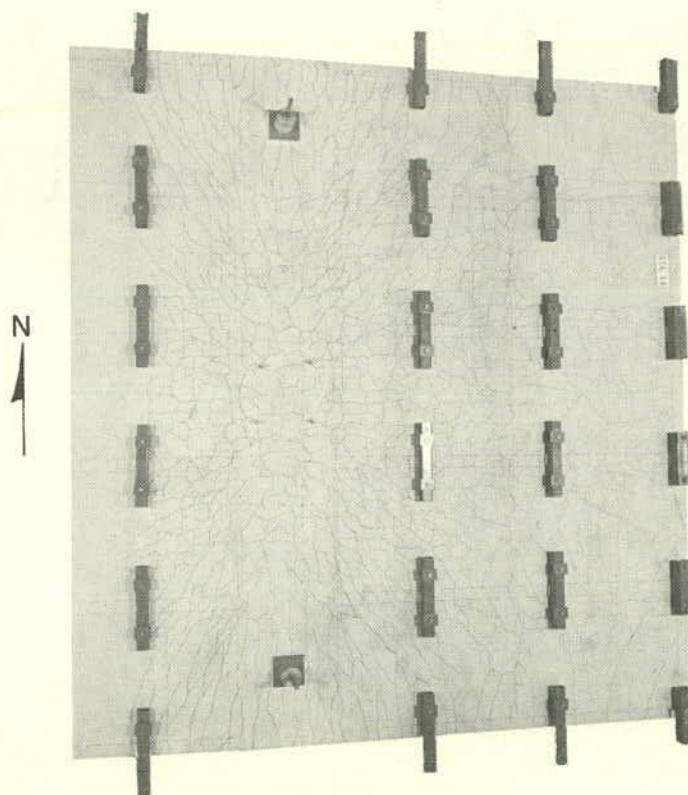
Deck Cracking of Specimen ST-6 at End of Test
